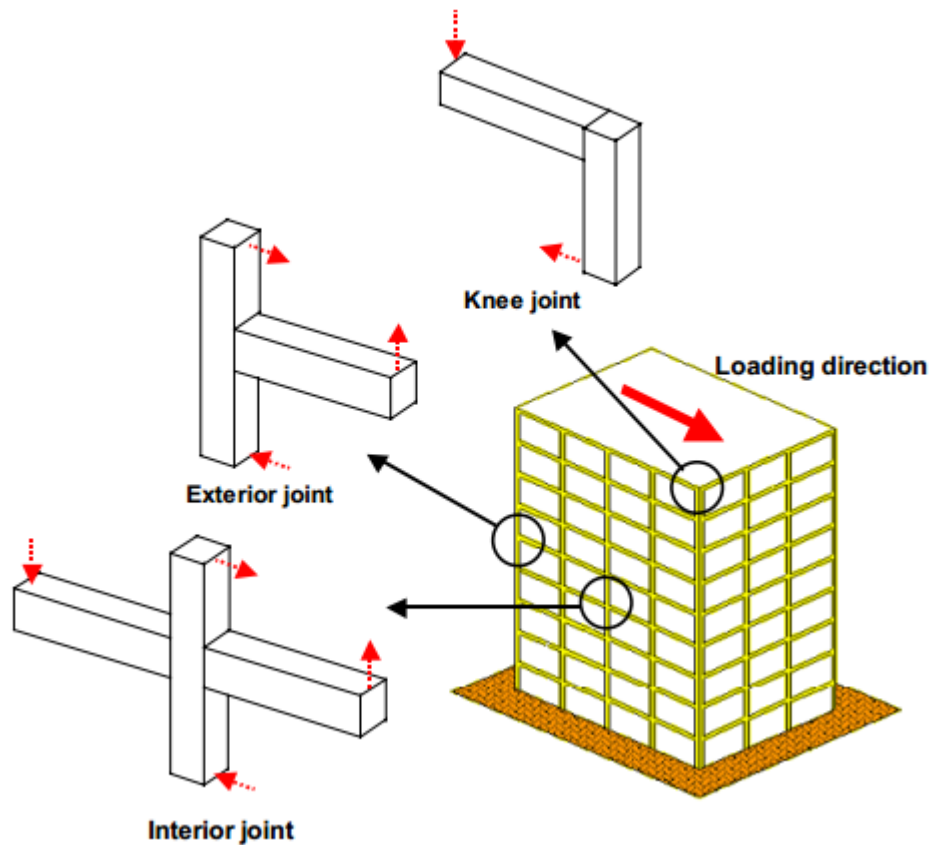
Terminology of RC beam column connections (Kim and LaFave, 2009)
